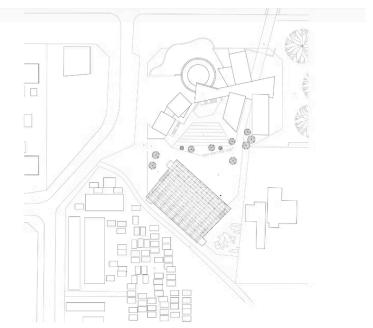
the site plan of new theatre (Source Louw 2021:184)
